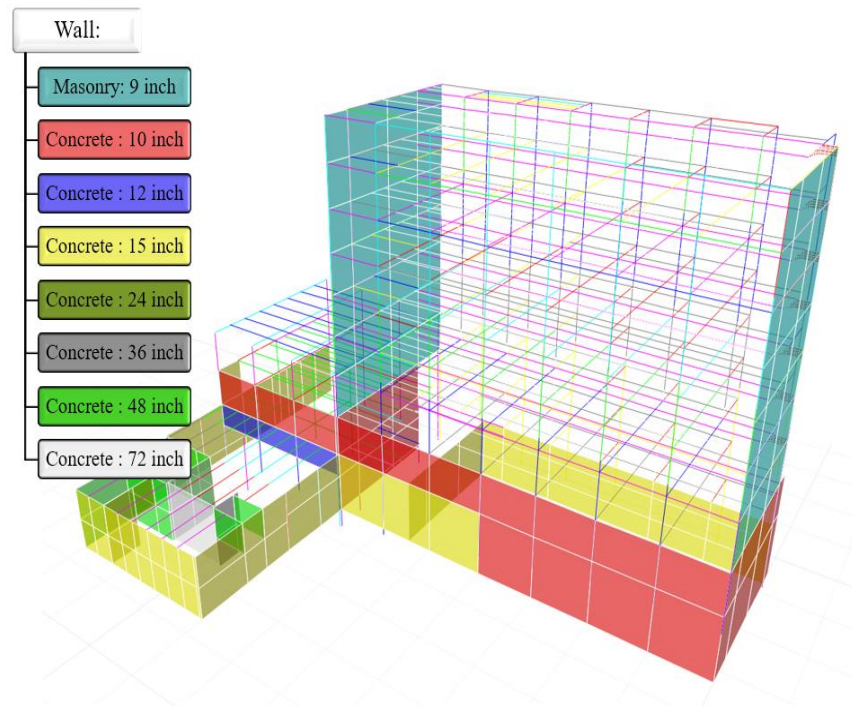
Masonry walls and reinforced concrete shear walls as modeled in JPL 183, color-coded by thickness.
